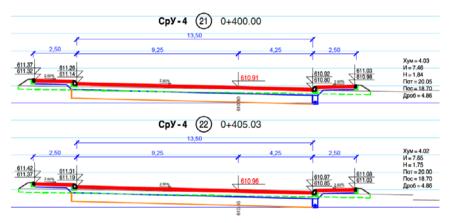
Transverse profiles of the residential street "SrU4" Source: Basic project for linear infrastructural construction in ARM district 1, Book 2
